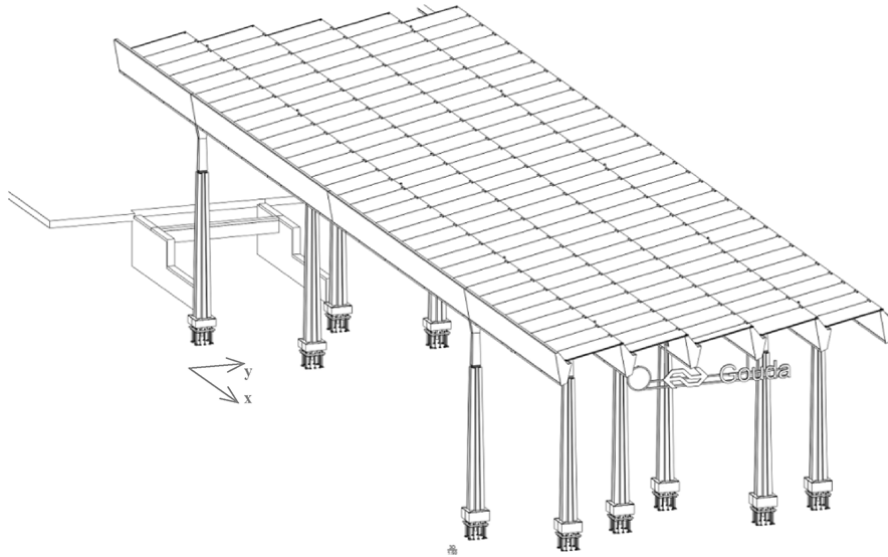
Axonometric view of the glass reinforced steel structure. [Haarhuis et al., 2016]
